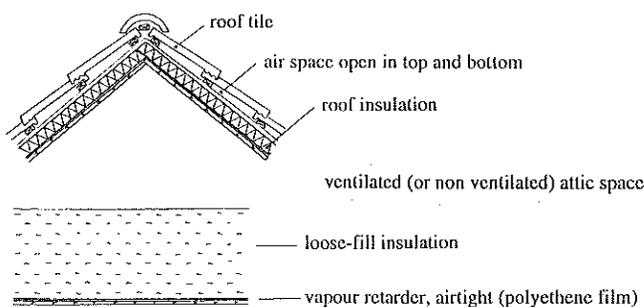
If the outside of the inner roof layer is insulated, the inner roof layer itself and the roof space will become somewhat warmer and dryer. If, in addition, inner roof ventilation is reduced or stopped entirely, there will no longer be the adverse effects that can arise from ventilation, particularly during cold, clear nights. However, stopping ventilation entirely involves a risk of damage if moisture finds its way into the roof space.
